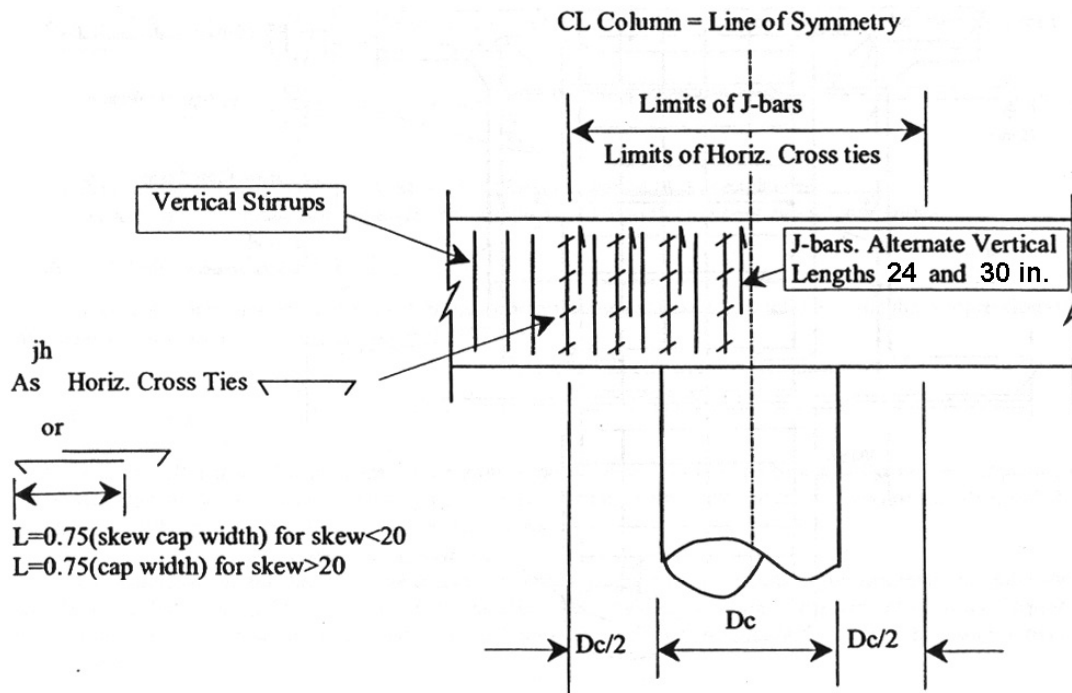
Location of Horizontal Joint Shear Reinforcement
